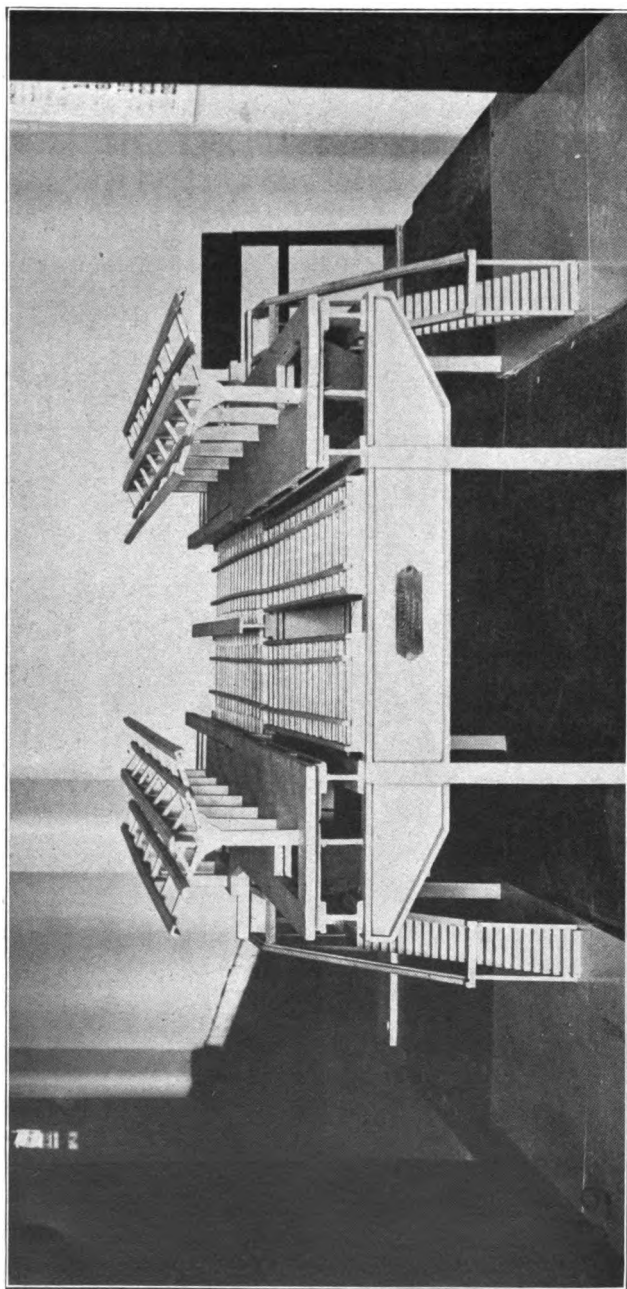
MODEL OF PROPOSED "SUBTRACK STATION" FOR REDUCING OBSTRUCTION TO LIGHT AND VIEW. END VIEW SHOWING CANOPIES OF "SAW TOOTH" DESIGN AND WIRE GLASS, COVERING THE PLATFORMS. TICKET OFFICES AND WAITING ROOMS BELOW THE TRACKS AND PLATFORMS, ON THE LEVEL OF THE PRESENT CROSSOVER FOOT-WAYS. (BLACK GIRDER AND POST TO RIGHT ARE PART OF OLD STRUCTURE TO BE REMOVED.)
